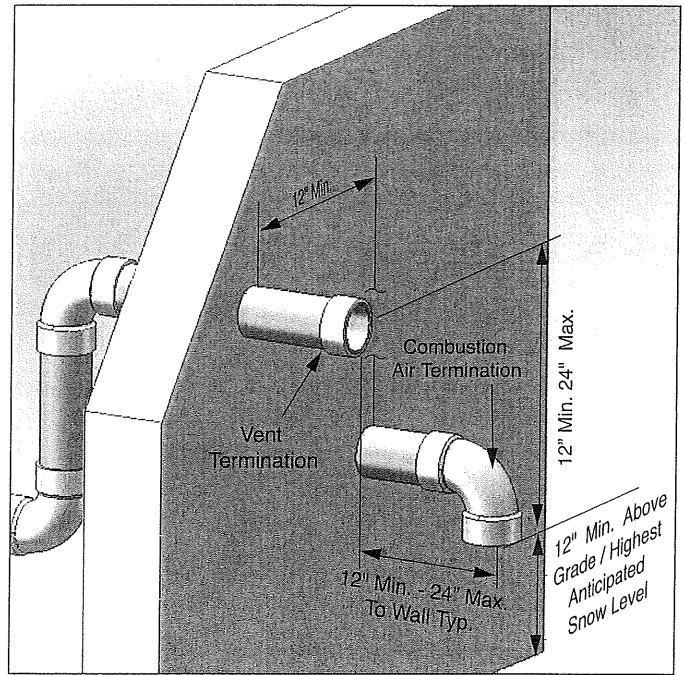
Direct Vent - Alternate Sidewall Termination of Vent and Combustion Air Piping
